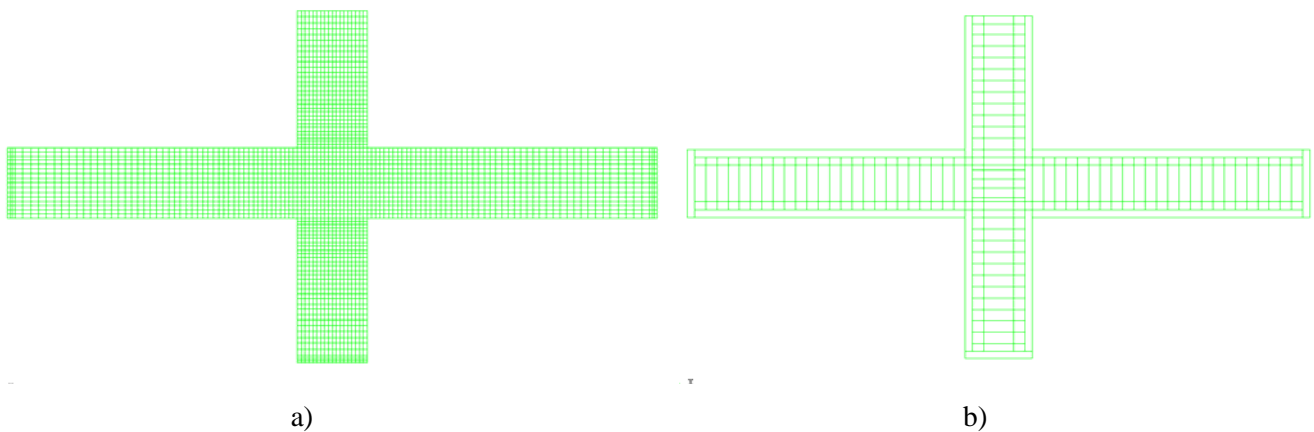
Adopted mesh: a) concrete material; b) steel longitudinal and transverse reinforcement.
